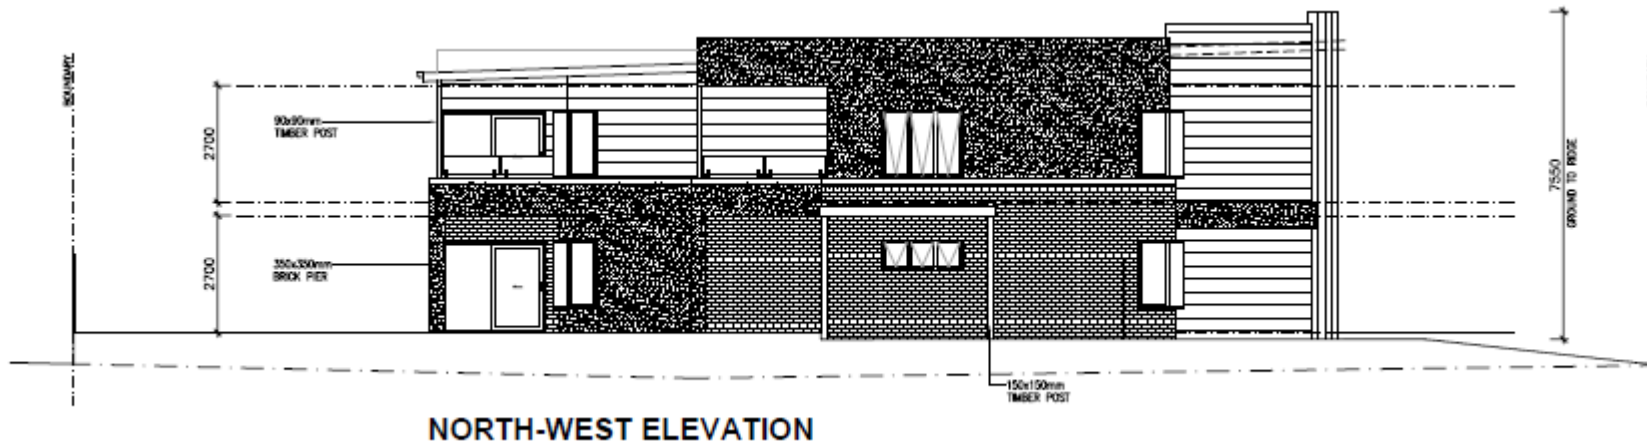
Proposed North-West Building Elevation Group Home (Source: Arkhi Design & Consulting, 2023)
